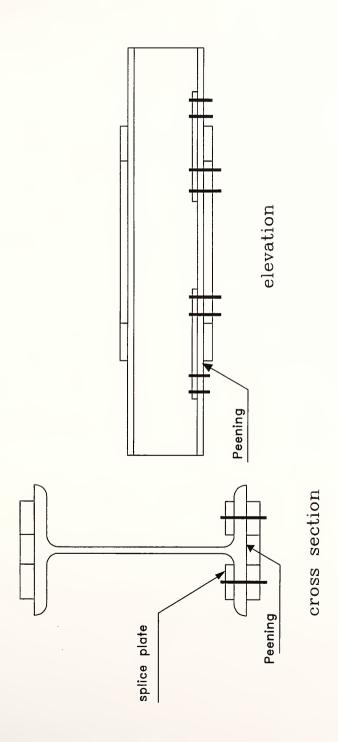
Partial Bolted Splice Connection. (Elevation and Cross—Section)
